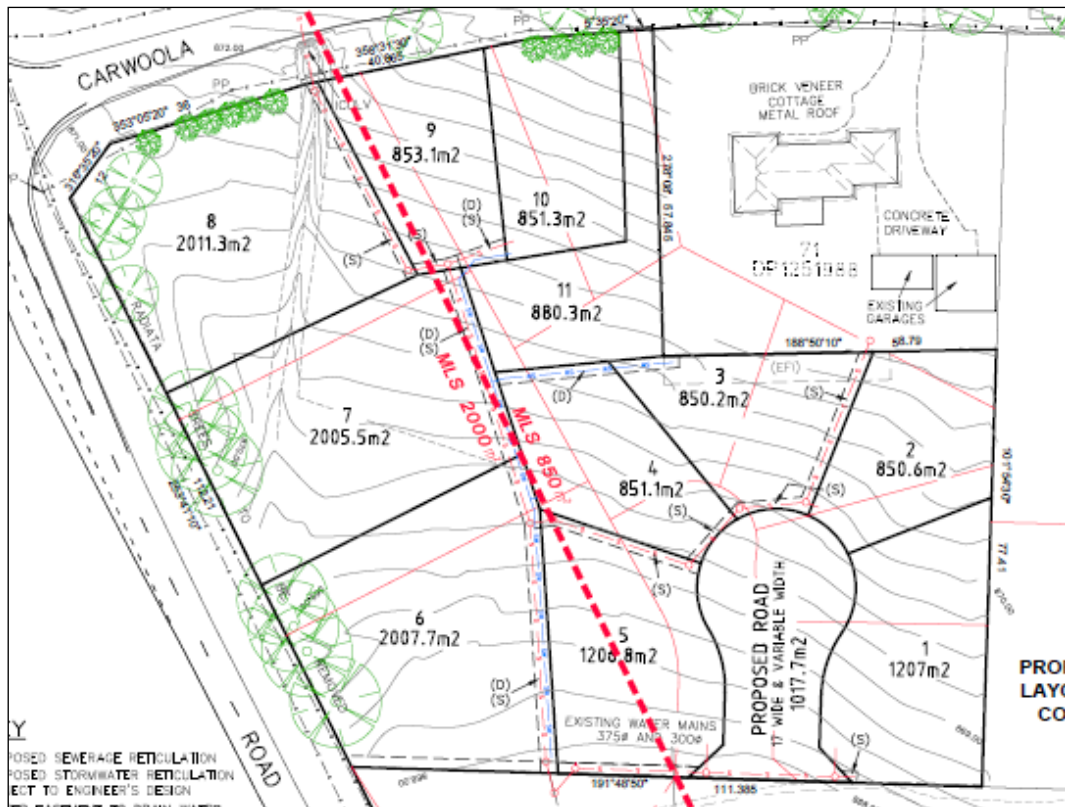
proposed subdivision and Area 3 Conceptual Subdivision Layout
